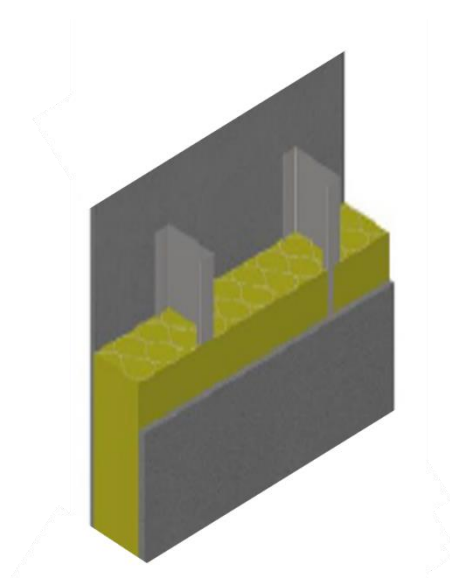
Diagram of steelframe wall element consisting of anhydrite plates connected by steel C-profiles with cellulose insulation.
